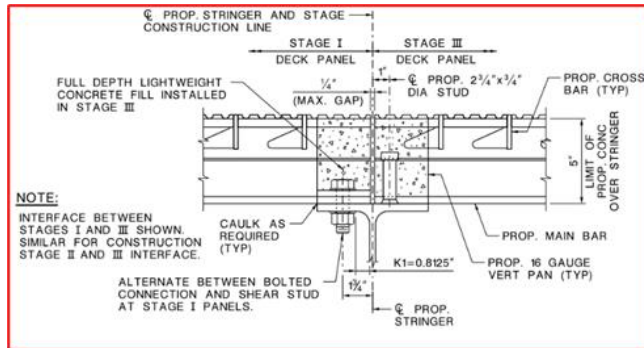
Detail of Concrete Fill, Shear Studs, and Hold Downs at Stagelines
